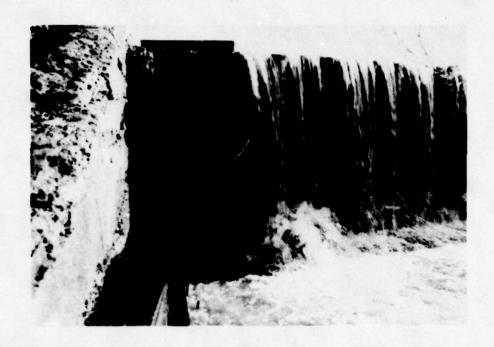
View of downstream face of spillway showing outlet conduit (Board placed on spillway crest is not part of the structure)
